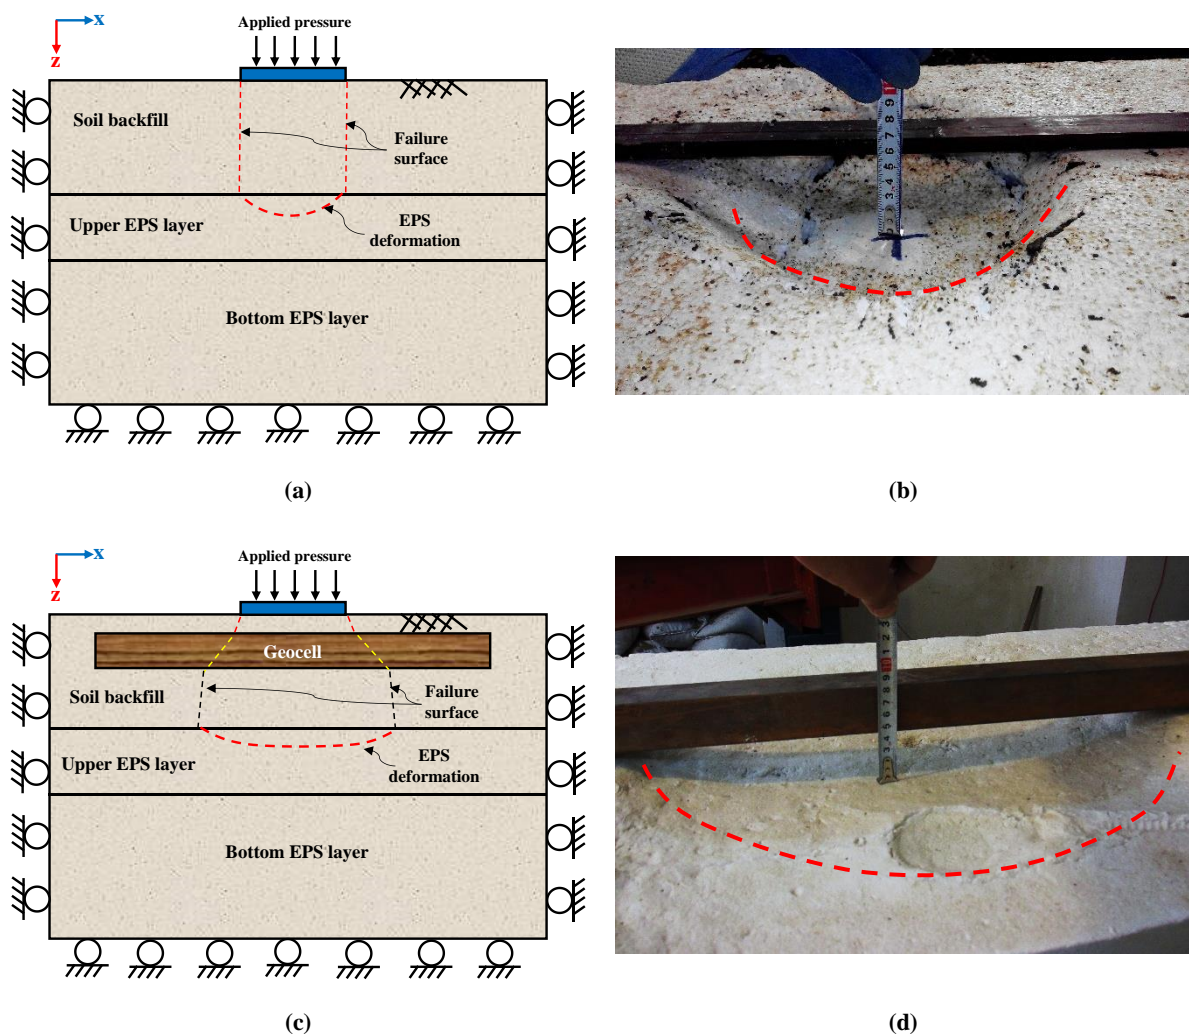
(a) Schematic view of the possible failure mechanism for unreinforced pavement foundation, (b) typical punching failure of EPS geofoam, (c) Schematic view of the possible failure mechanism of geocell reinforced pavement foundations (d) typical wider deformation basin of EPS geofoam under geocell reinforced pavement foundation
